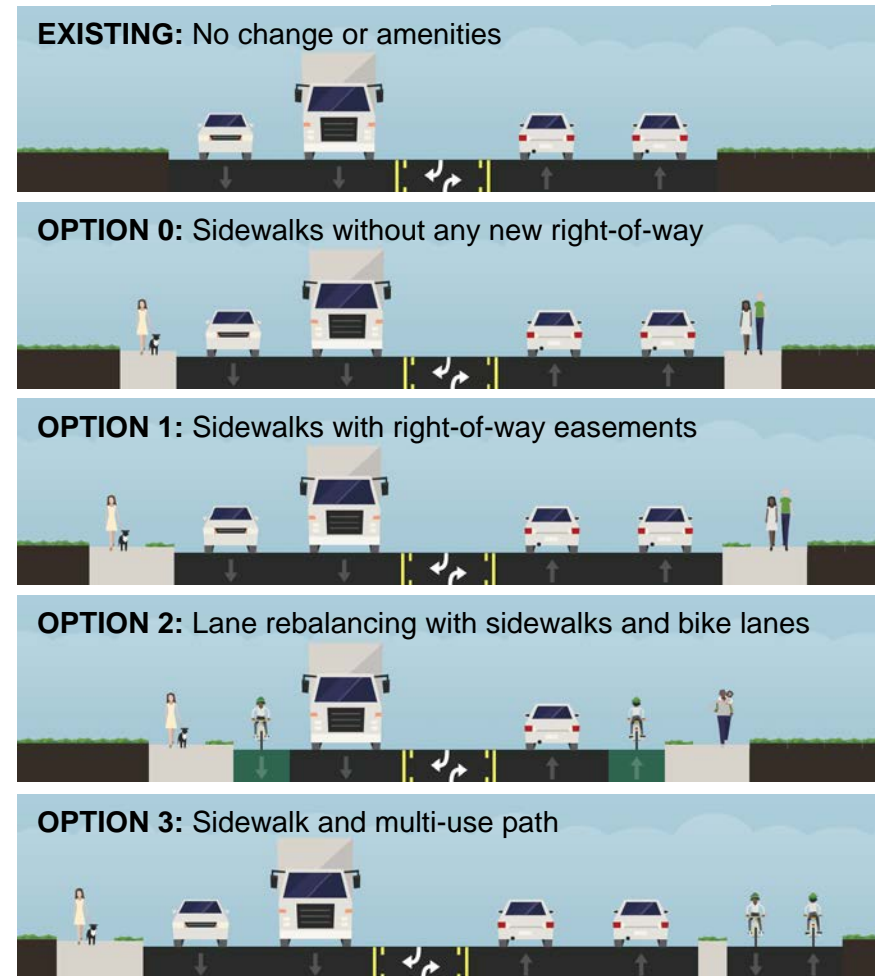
M-139 and Pipestone Road Area Alternatives
